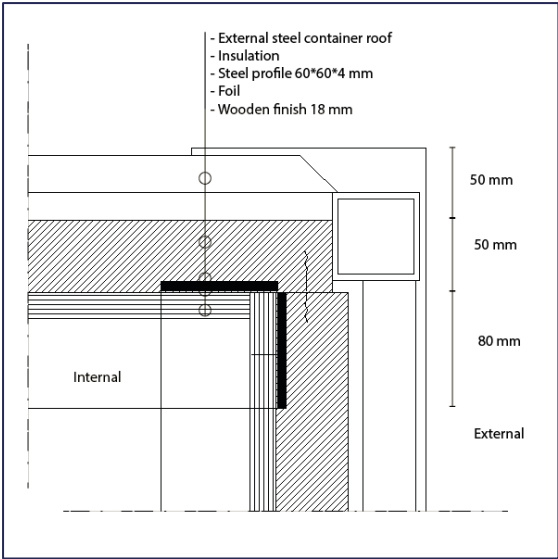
; Detail 1; vertical section of the wooden framework at the corner connection
